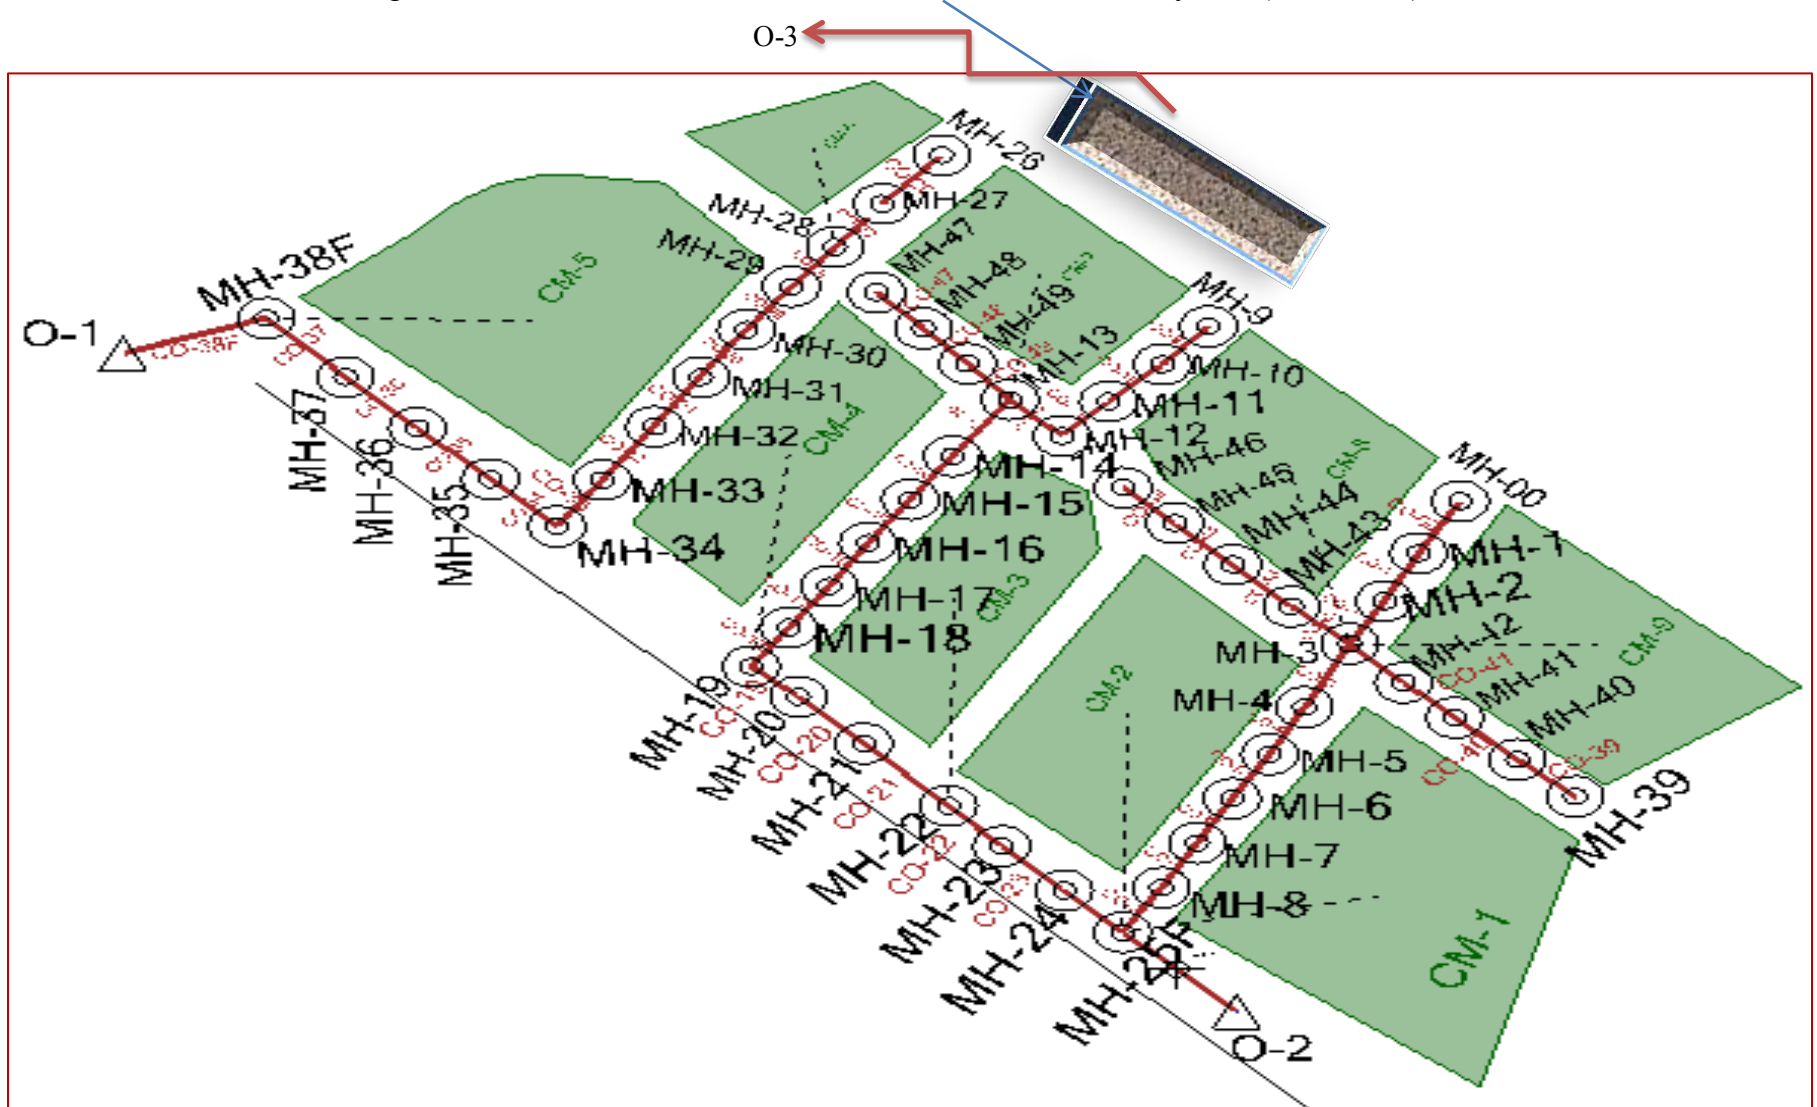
Final Storm Sewer alignment based on length, ground elevation and size of pipe
